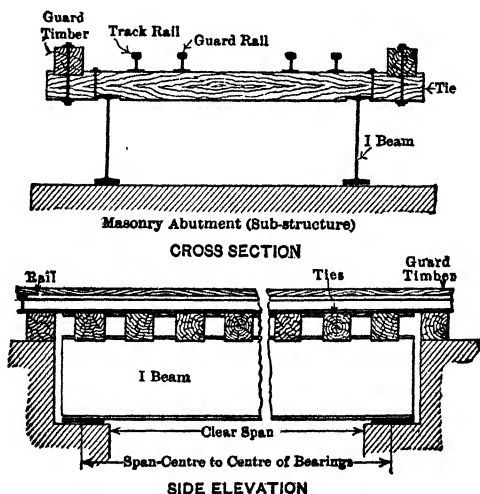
I-beam bridge for single-track railroad. (A deck structure.)
